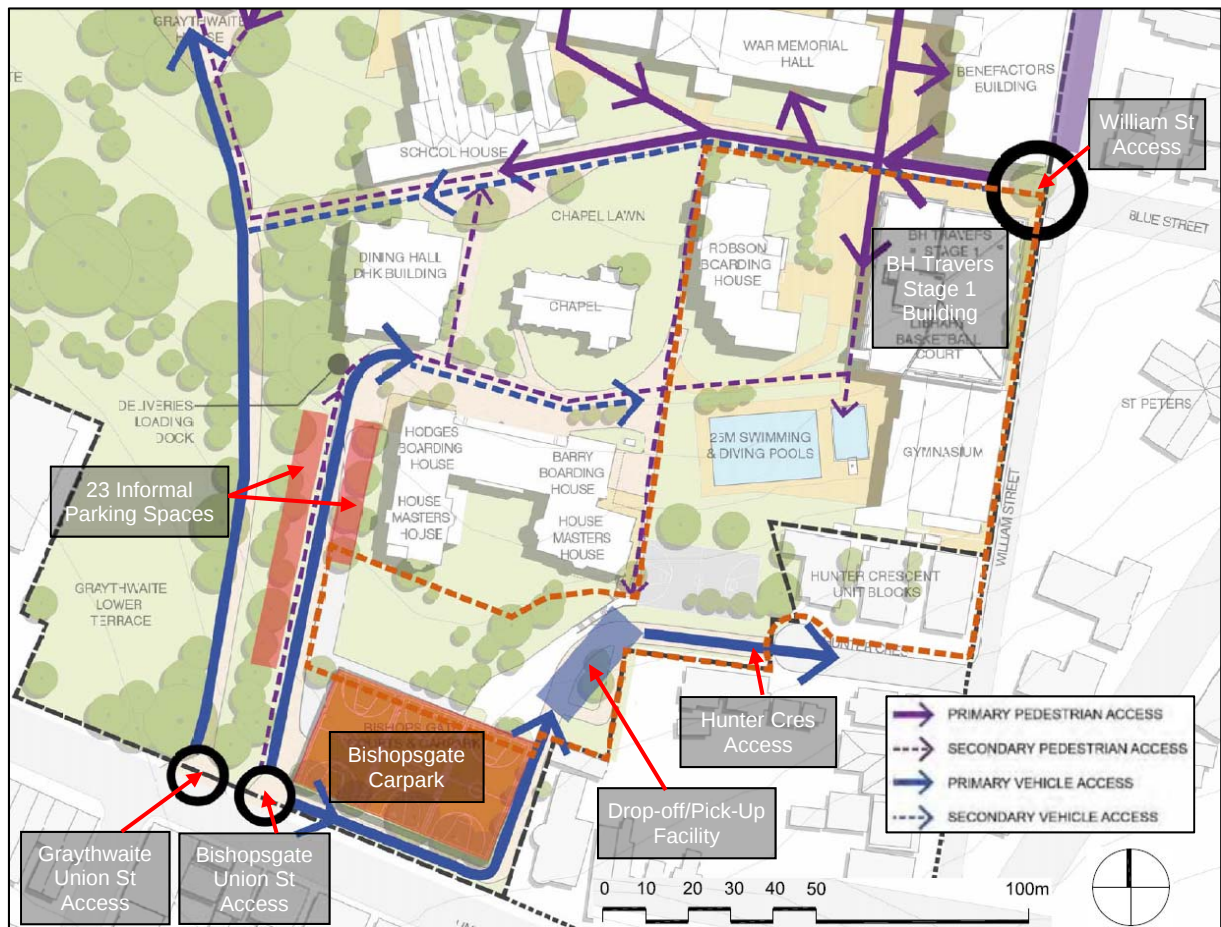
Existing site layout (showing circulation paths) (Source EIS)
